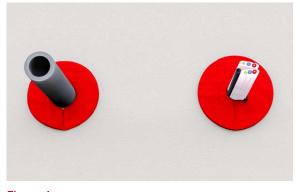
SpeedSeal for sealing around conduits and electrical cables
